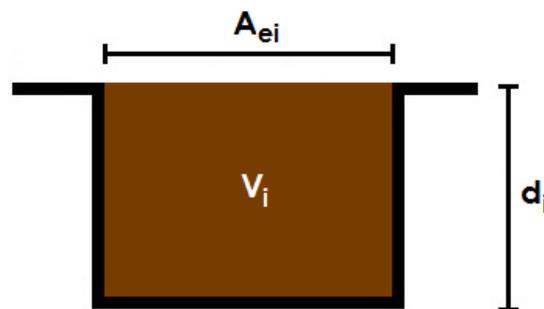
Excavated volume of soil and rock from the construction of a house foundation
